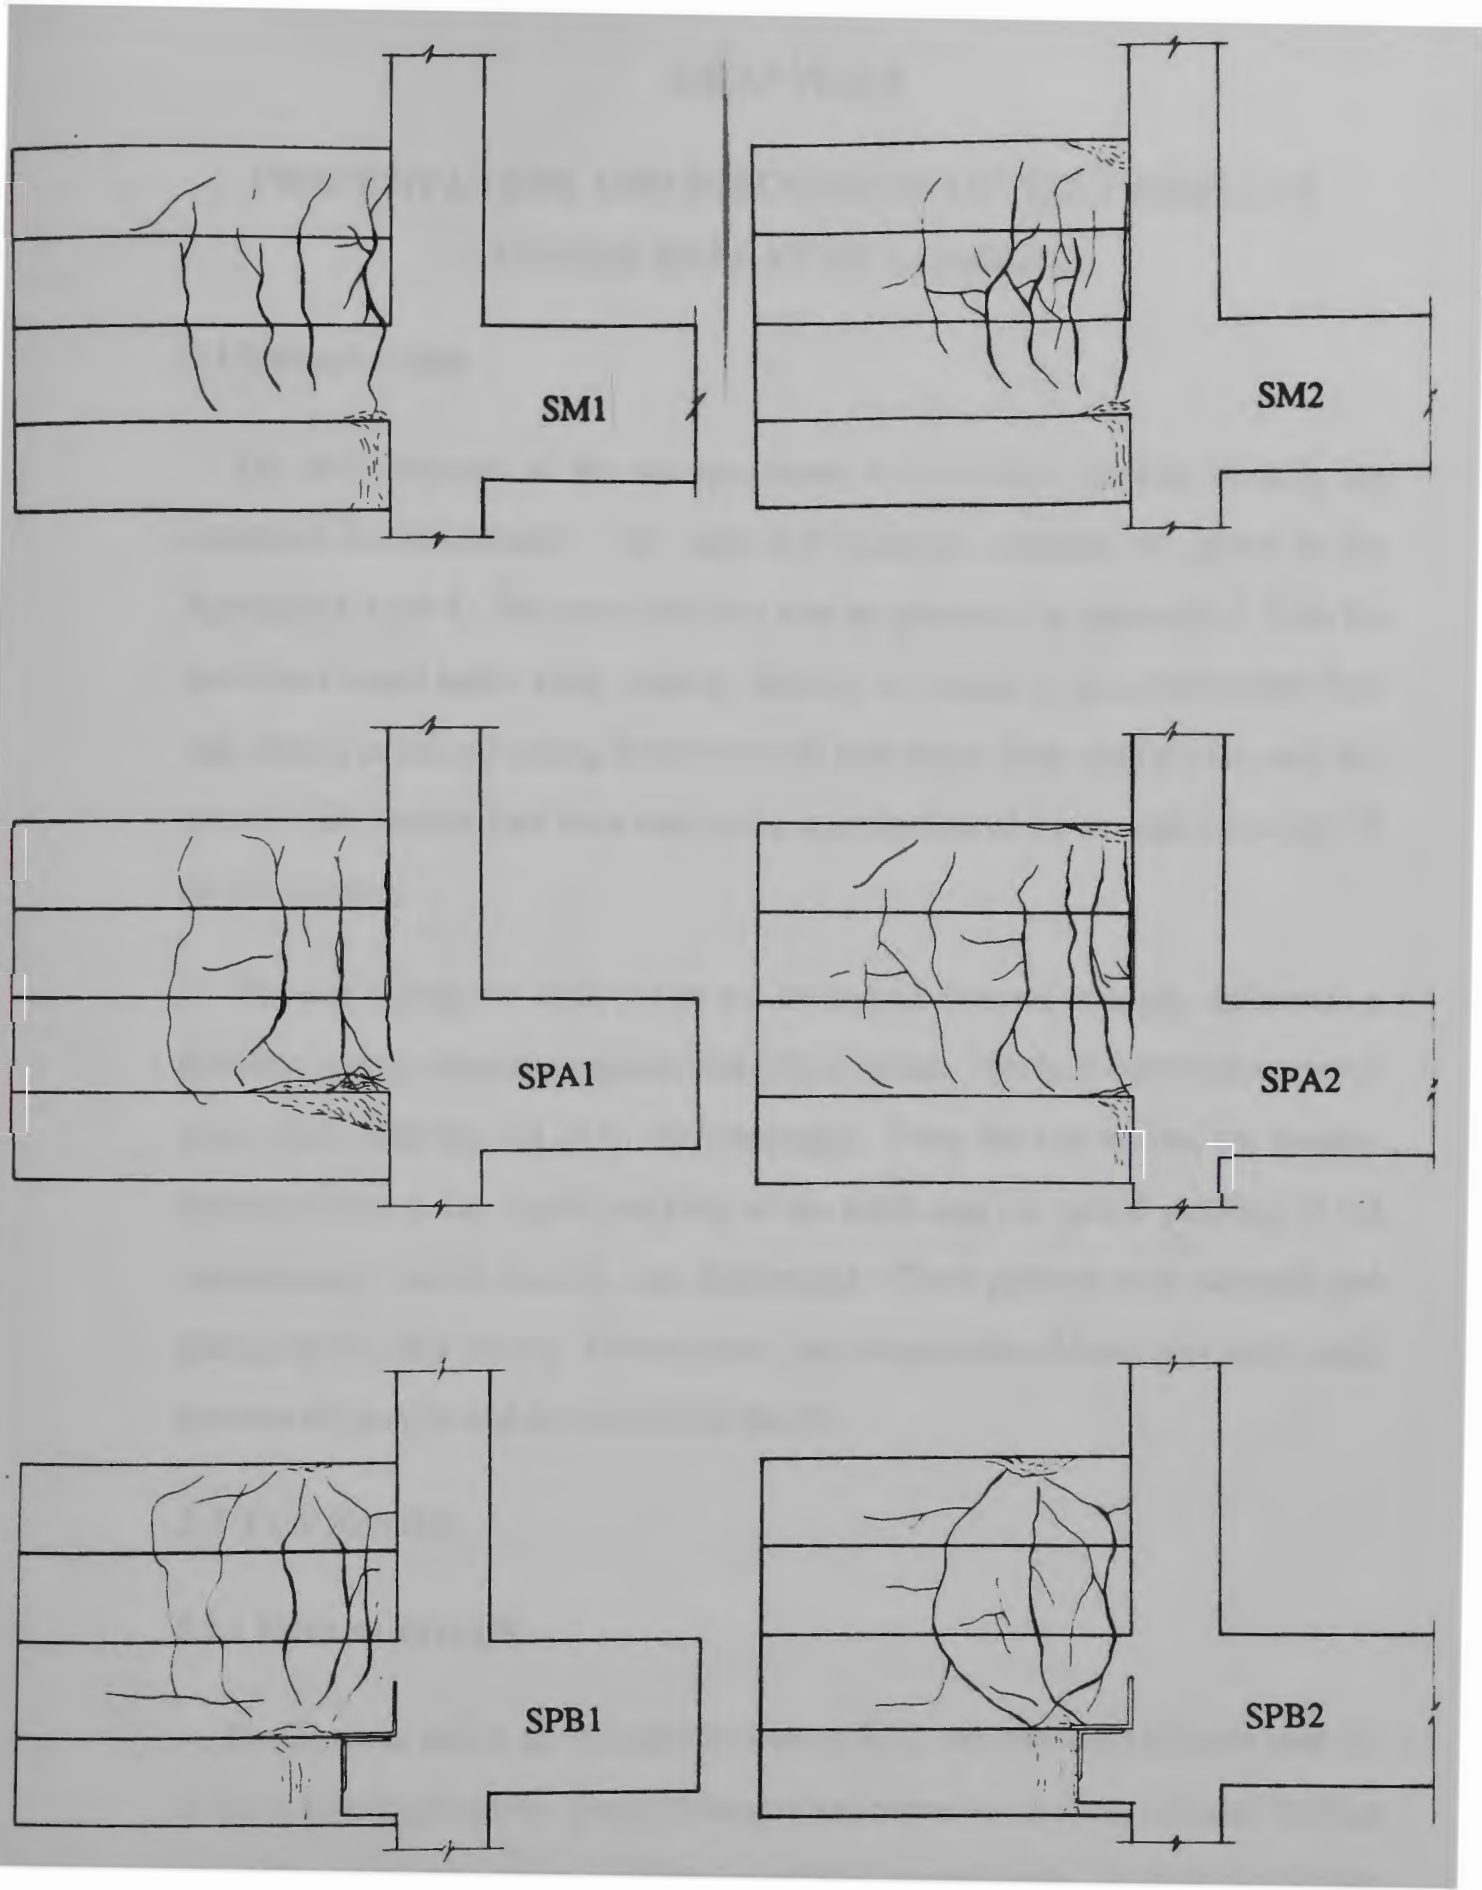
Crack Pattern for All Specimen Tested Under Static Loading
